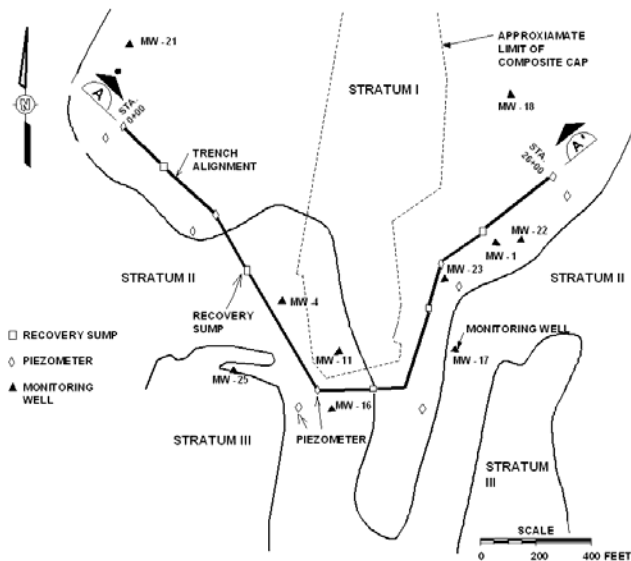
Location and layout of the gravel-filled interceptor trench.
